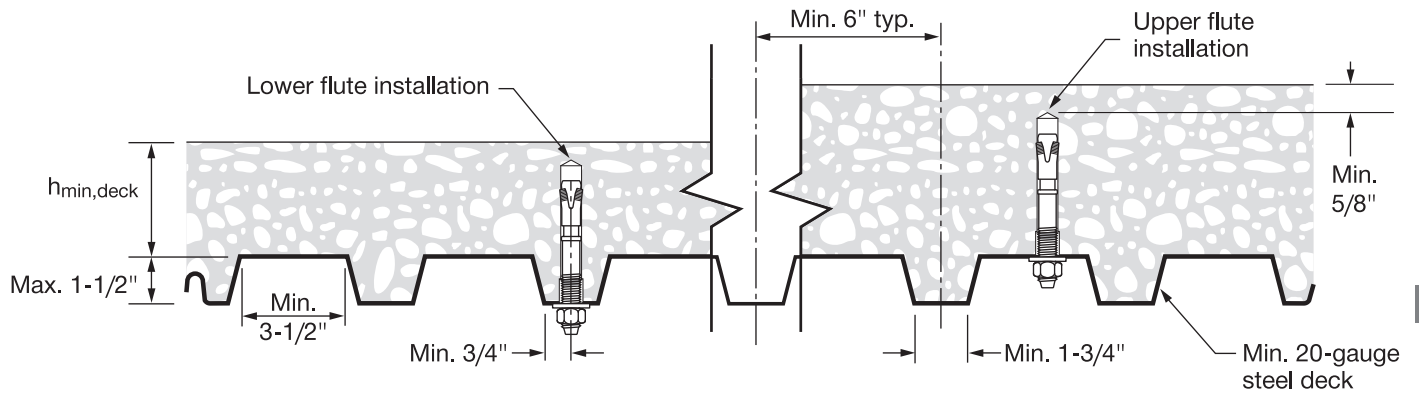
Installation in the soffit of concrete over metal deck floor and roof assemblies – B deck
